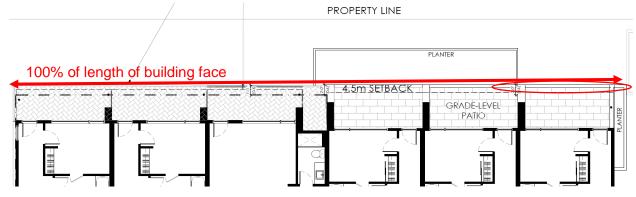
Proposed balcony siting exemption variance (adjacent to Witt Road)
